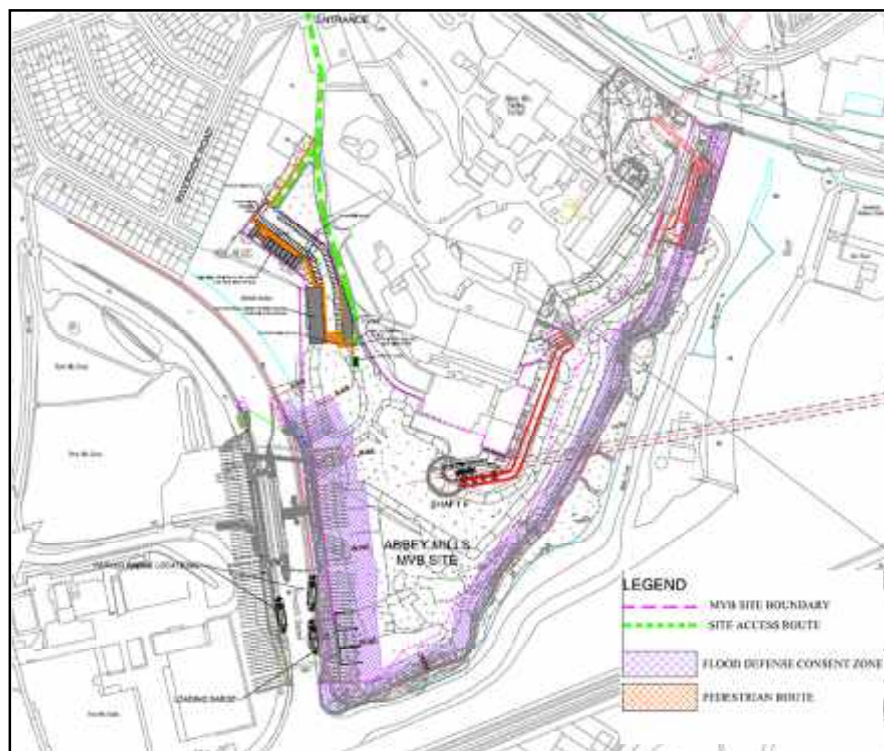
Abbey Mills PS site during the Lee Tunnel construction (*Abbey Mills Construction Management Plan, August 2010, produced by MVB*)
